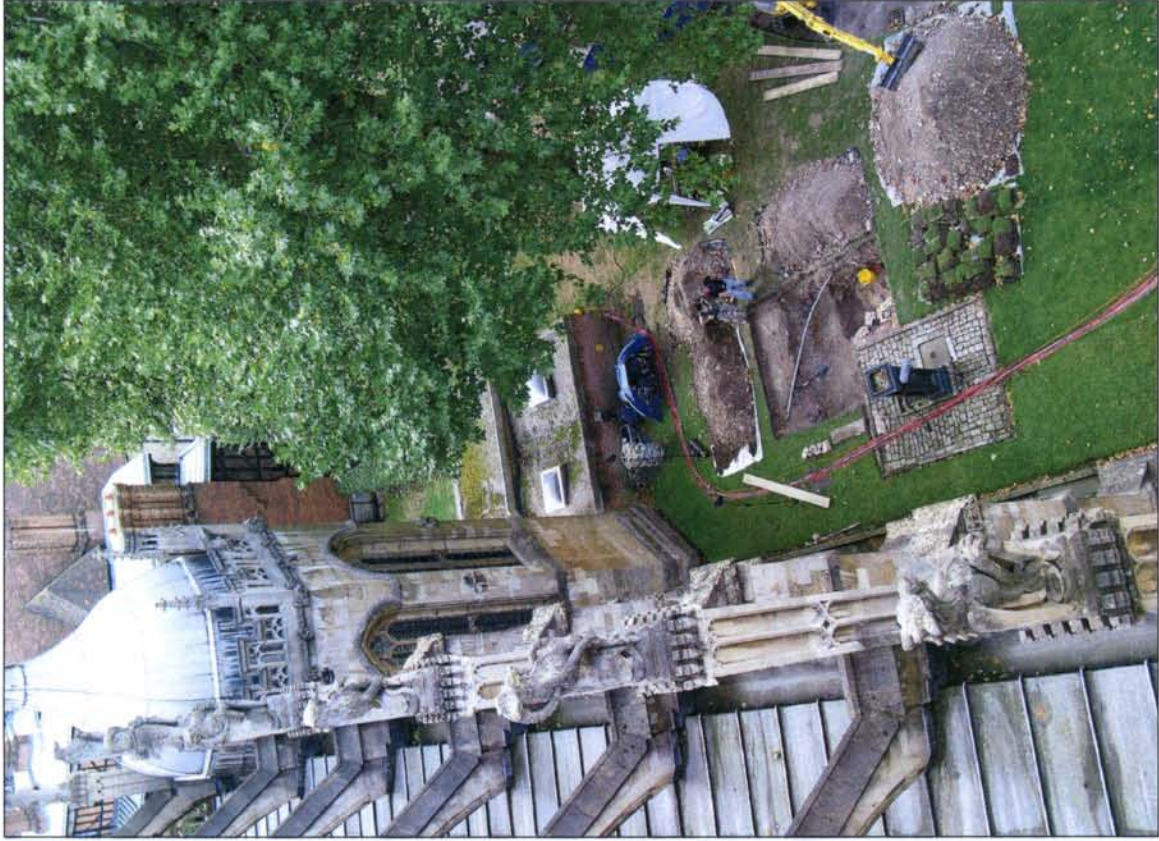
Trench 3. Looking west. Taken from roof of St. Georges Chapel.
